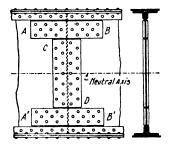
WEB SPLICE FOR PLATE GIRDER.
